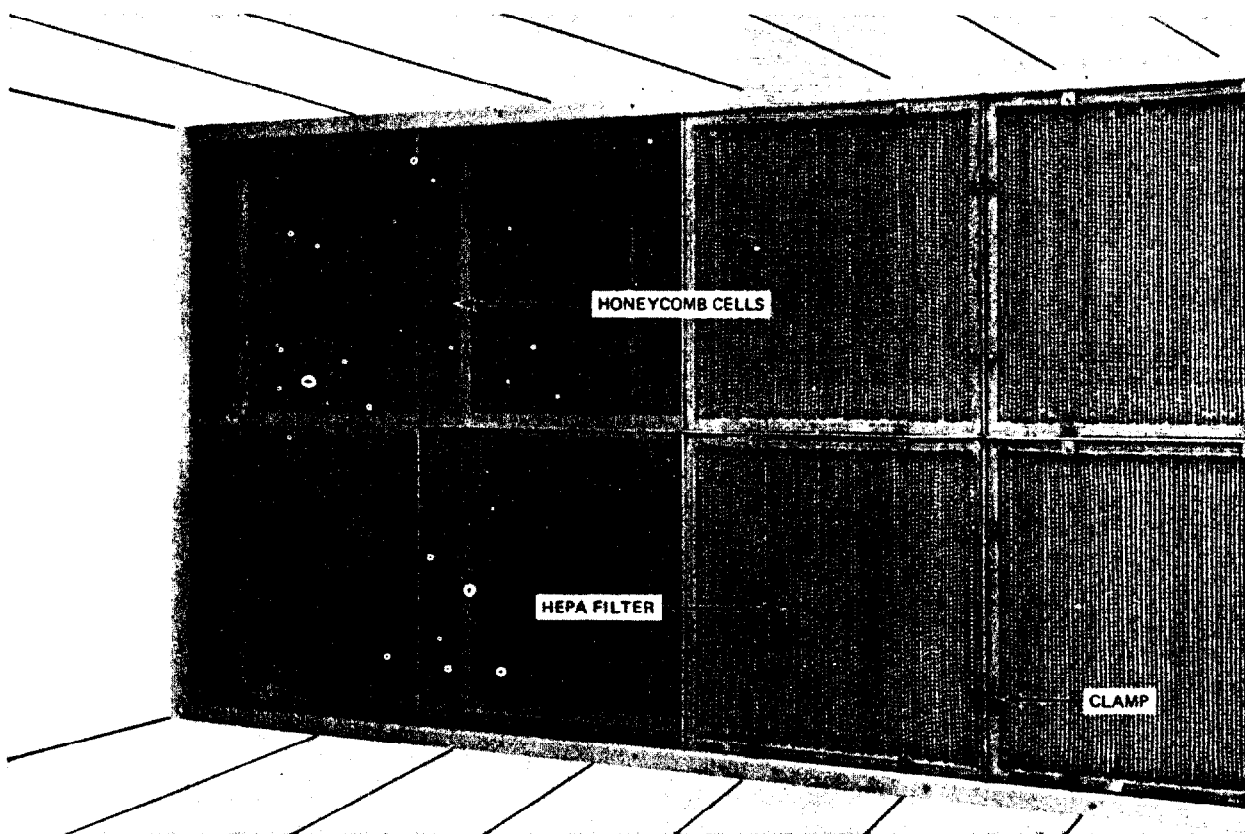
Honeycomb mounting frame made up of individual filter cells bolted or riveted together. Note the caulked joints and the light-duty filter mounting frame and clamping devices. Mounting frames of this type are not suitable for installing HEPA filters in nuclear exhaust applications.
